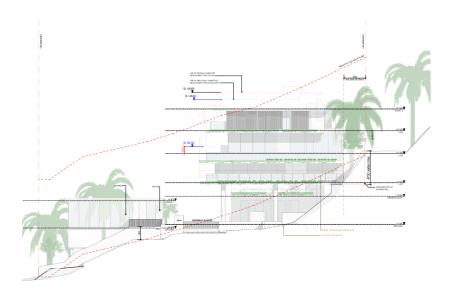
Revised design – reduction in building height & vehicle entry arriving at below existing ground levels.
